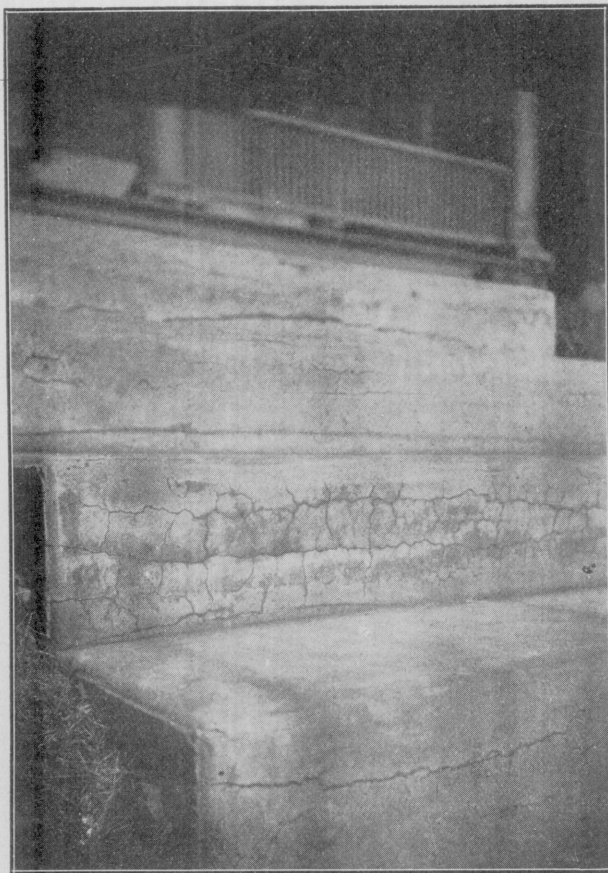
Concrete Steps, Showing Developed Hair Cracks.
